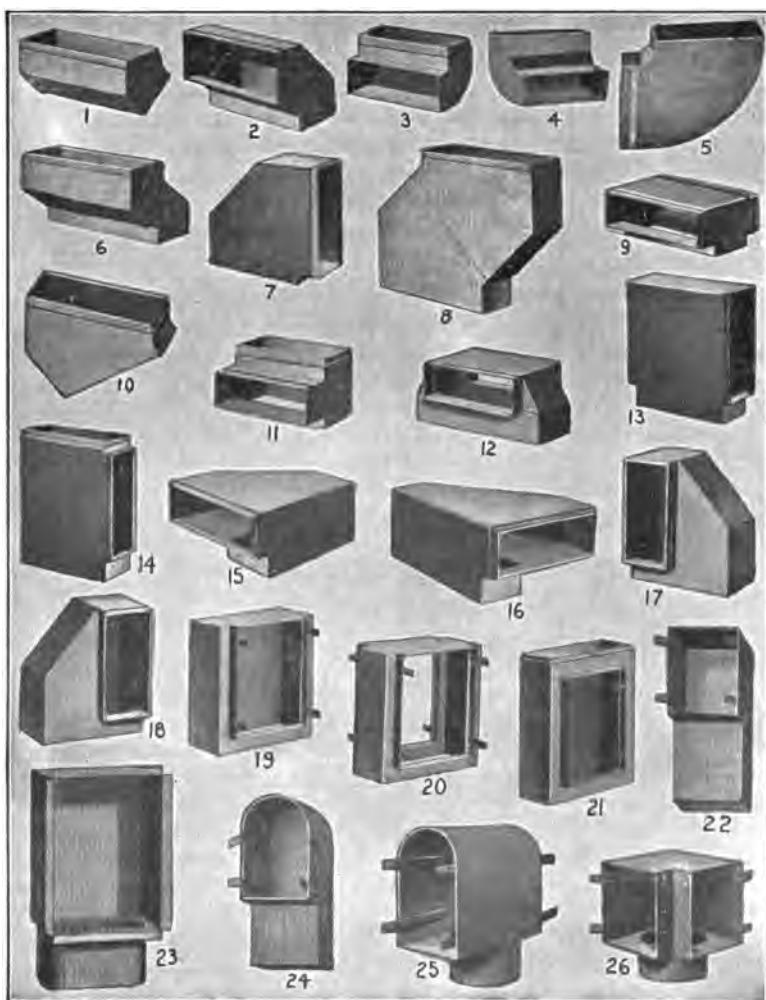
Twenty-six Styles of Single Wall Furnace Fittings.
